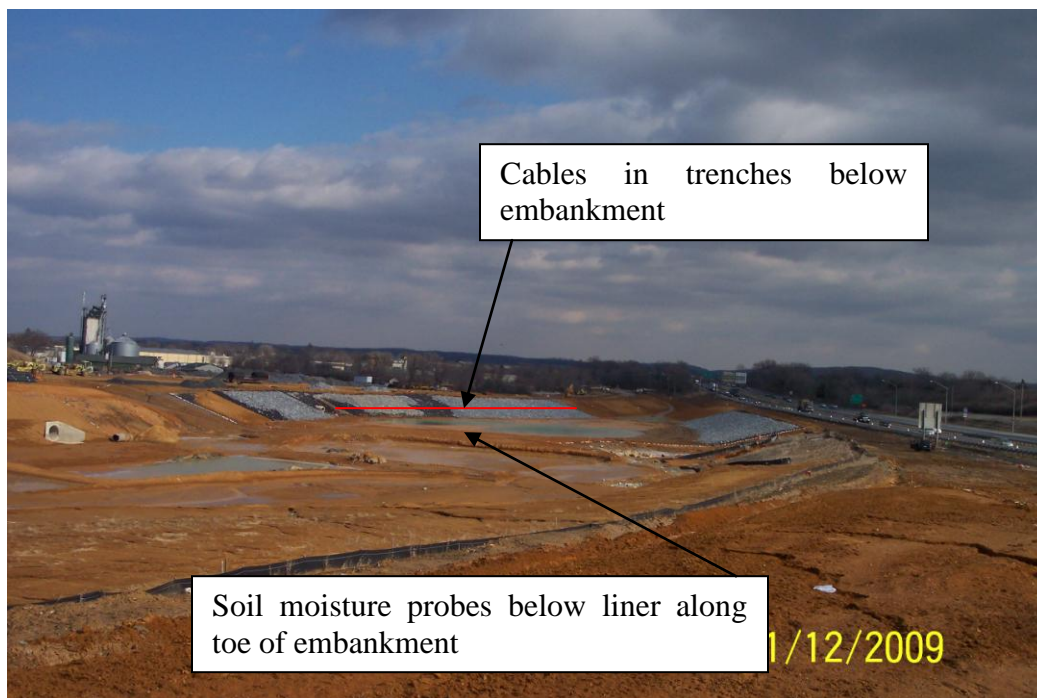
Cables were installed in trench prior to construction of Monocacy Boulevard embankment; I-70 is on the right side of the photograph
